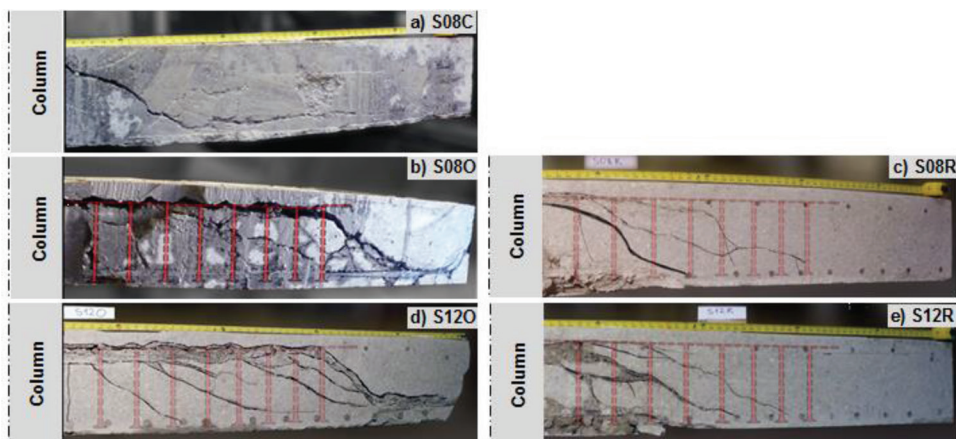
Inclined cracks and failure surfaces on cut sections.
